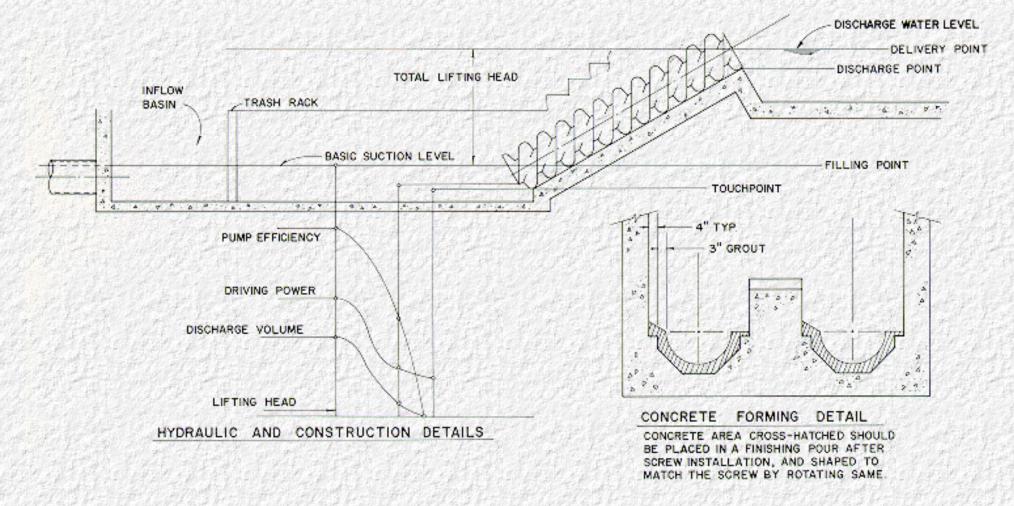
Hydraulic and Construction Details for Screw Pumps
